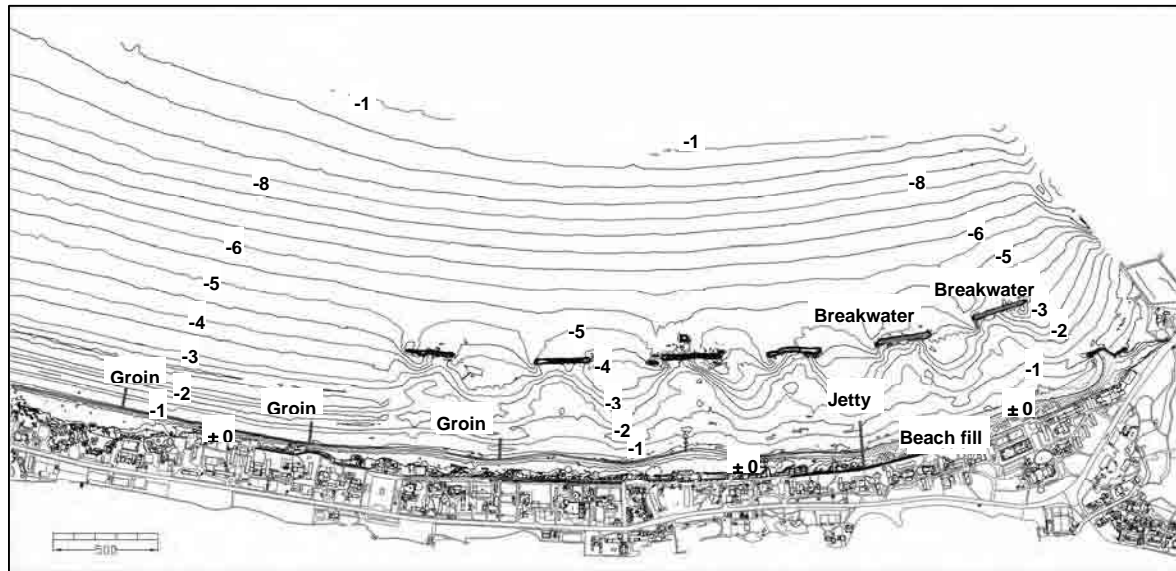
Layout of the shore protection facilities around Mamaia Sud
